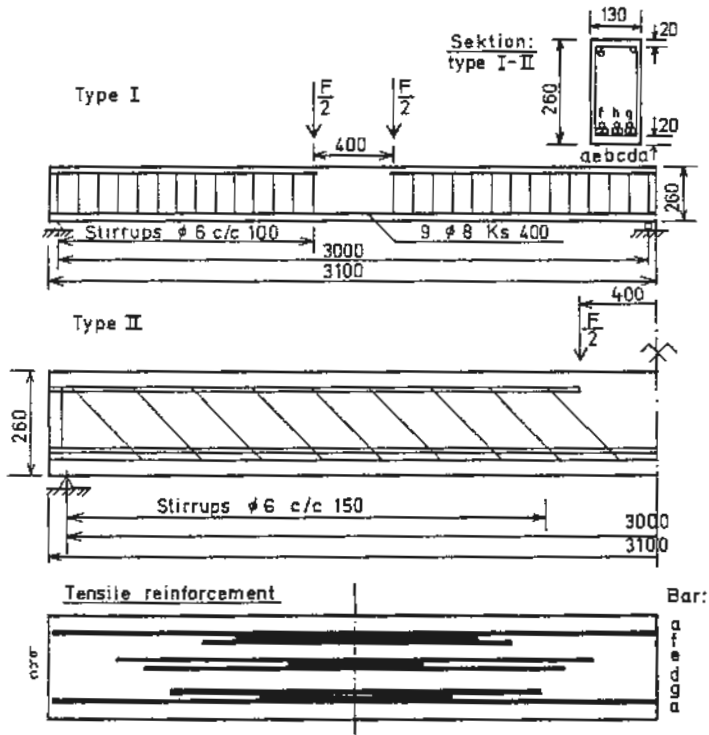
Design of the beams in Series A, beams A1 to A5.
